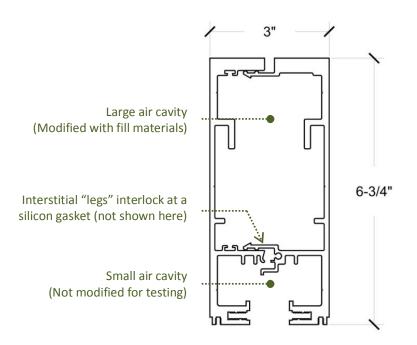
PLAN DRAWING OF UNITIZED VERTICAL MULLION PROFILE
